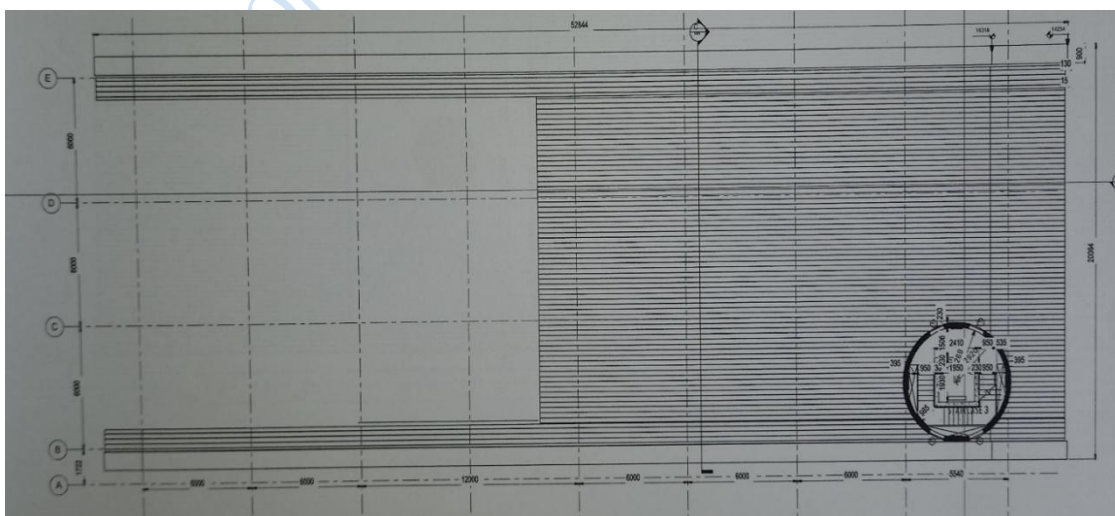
Fourth Floor plan of the Modern Bus Terminal at Ojoo in Ibadan.
